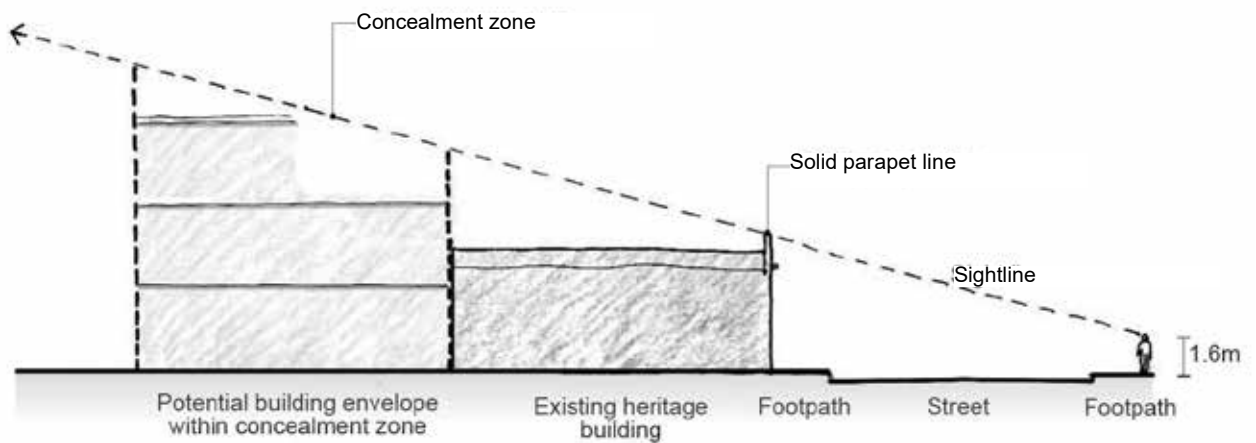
Sightline to achieve full concealment behind a Significant building or to any single-storey building in a consistent streetscape.
